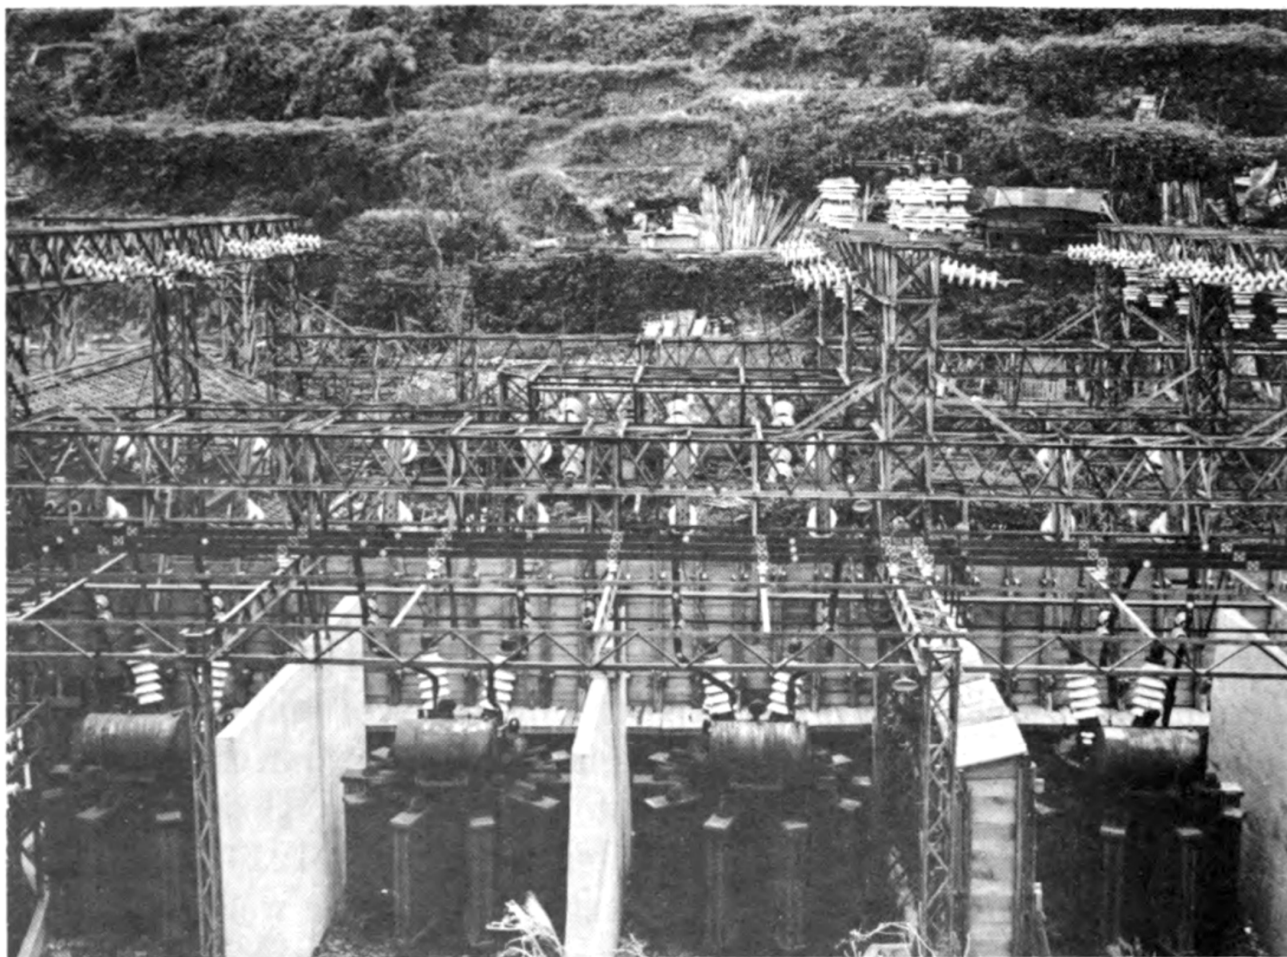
Reinforced-concrete blast walls protecting transformers (1 mile from ground zero at Nagasaki).
